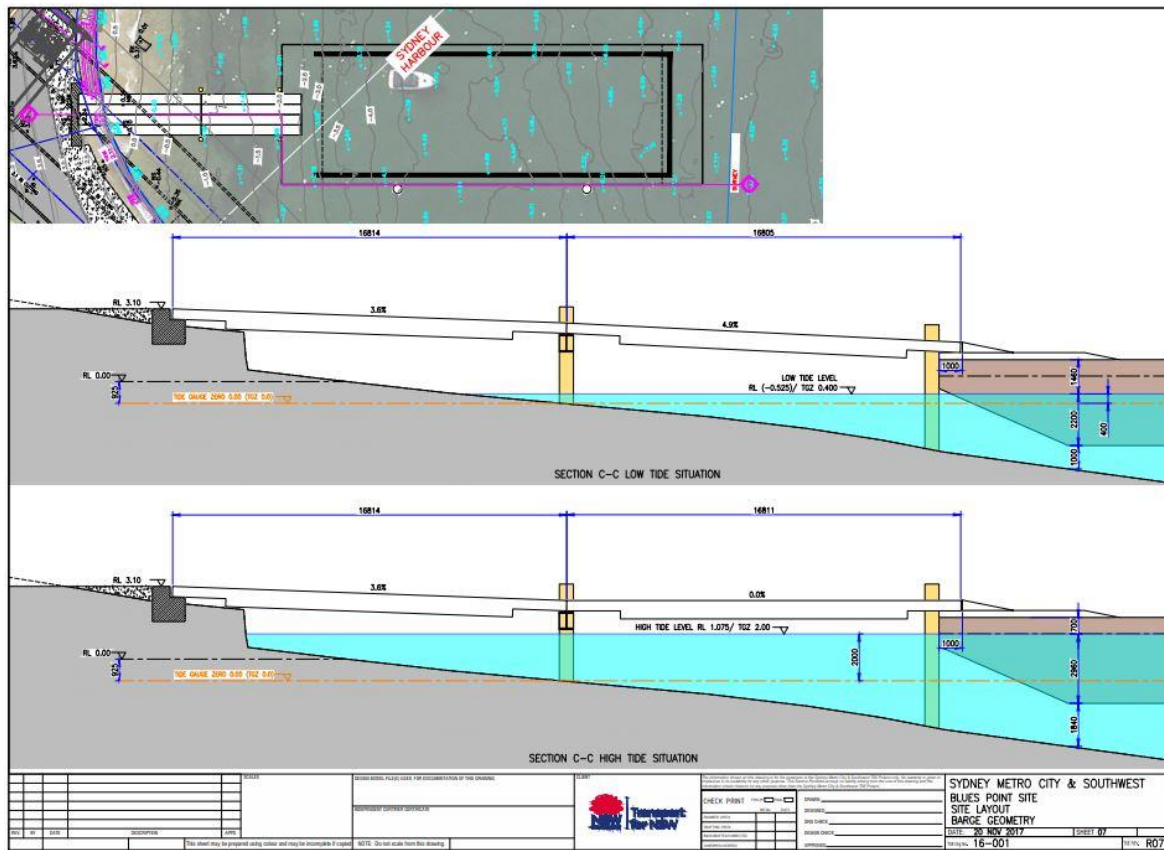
Indicative site layout barge arrangement (source: JHCPBG) (to be updated with current design including six piles for ramp and two mooring piles)
